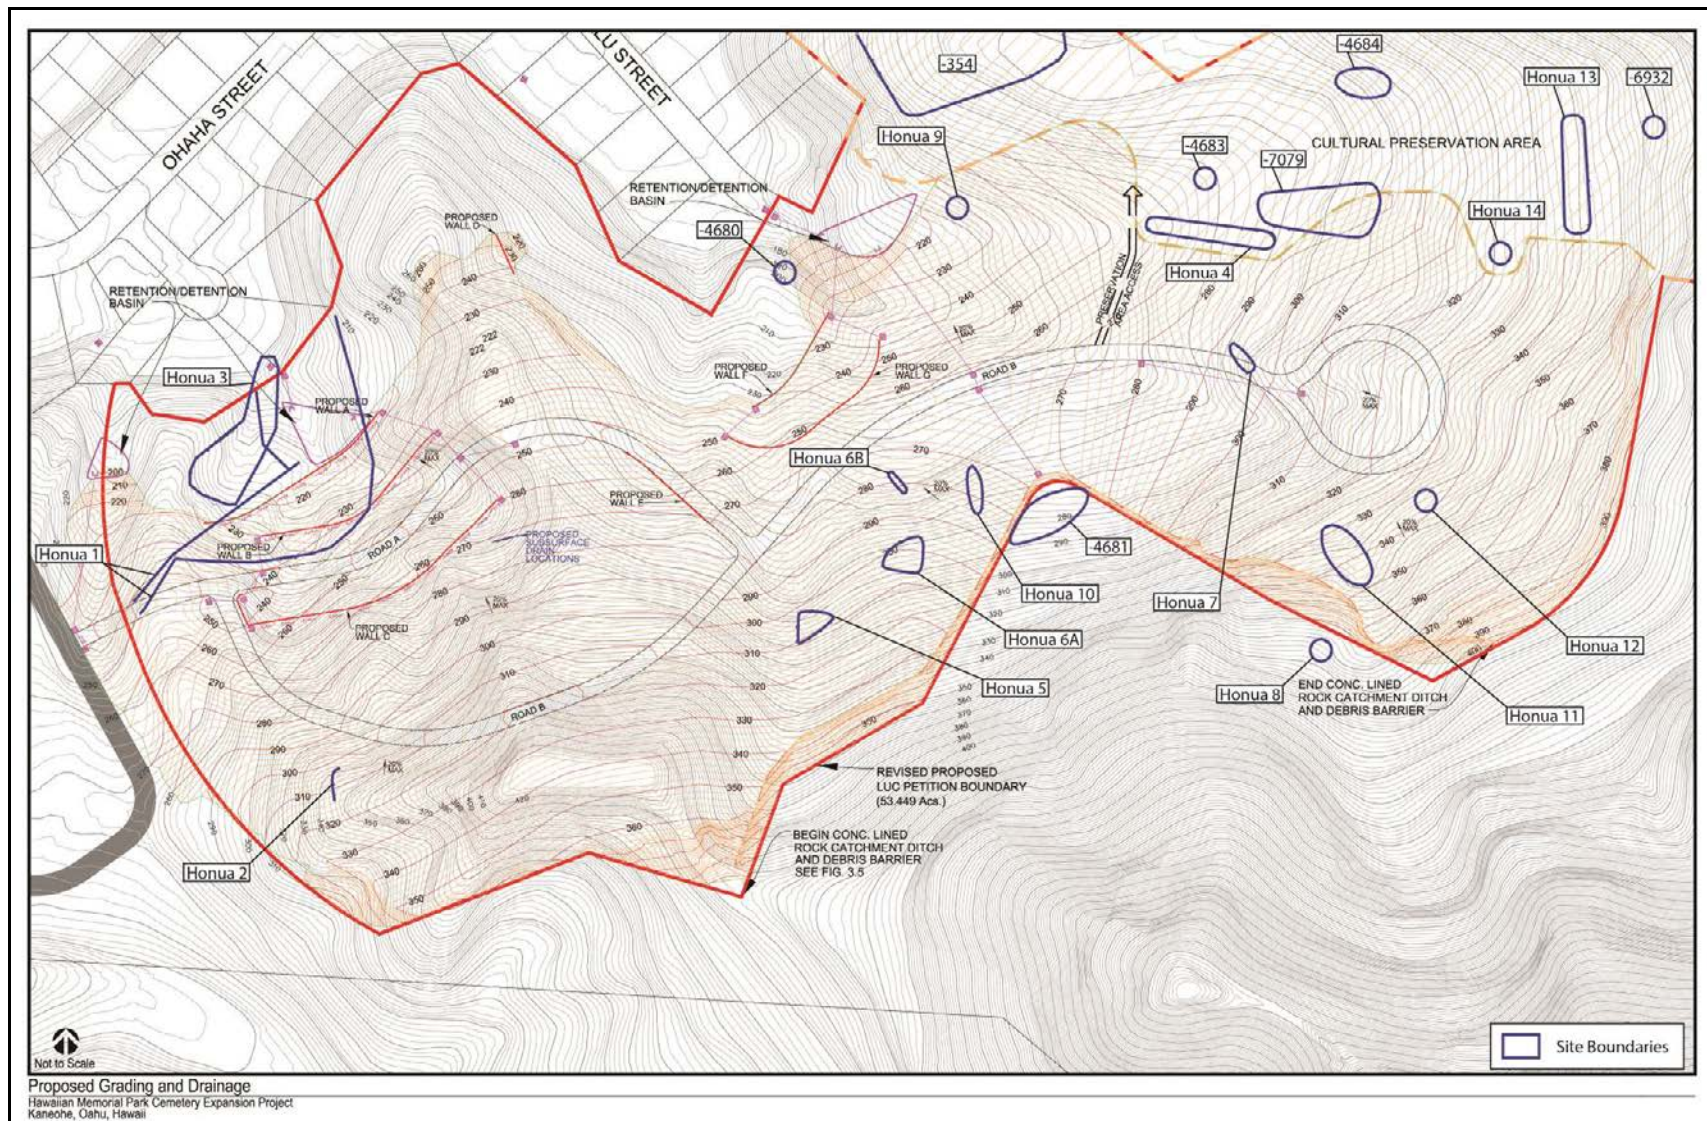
2018 Grading Plan showing locations of documented sites (amended from HHF Planners 2018)
